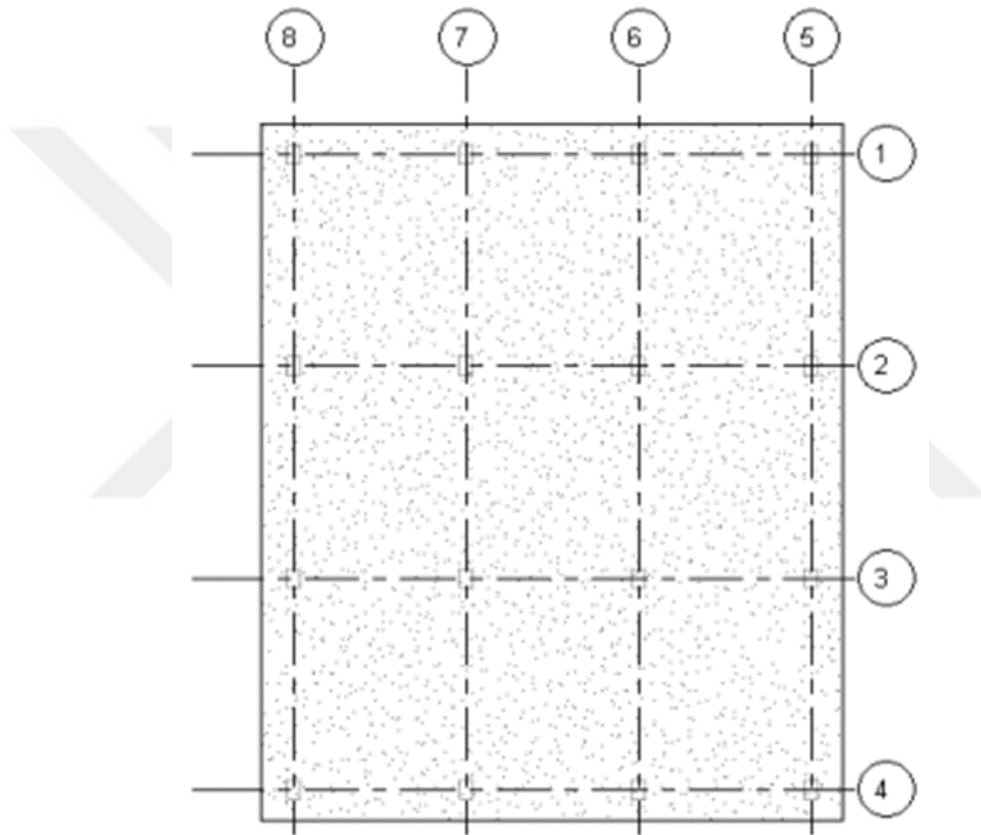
The Slab Spans Division (Exterior and Interior).
